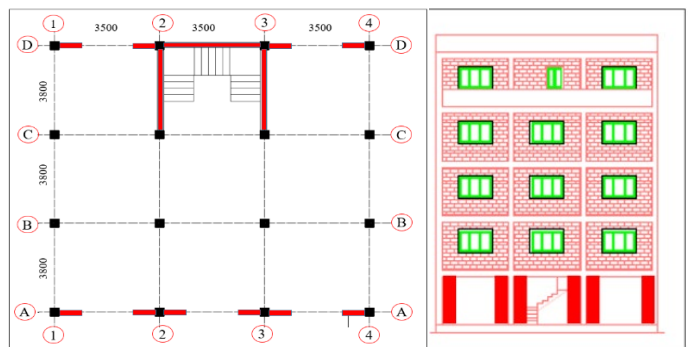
Retrofit plan for the soft first story of model NBC+ building. A combination of RC shear wall and wing wall controls excessive inelastic drift to keep the usability of open space.
